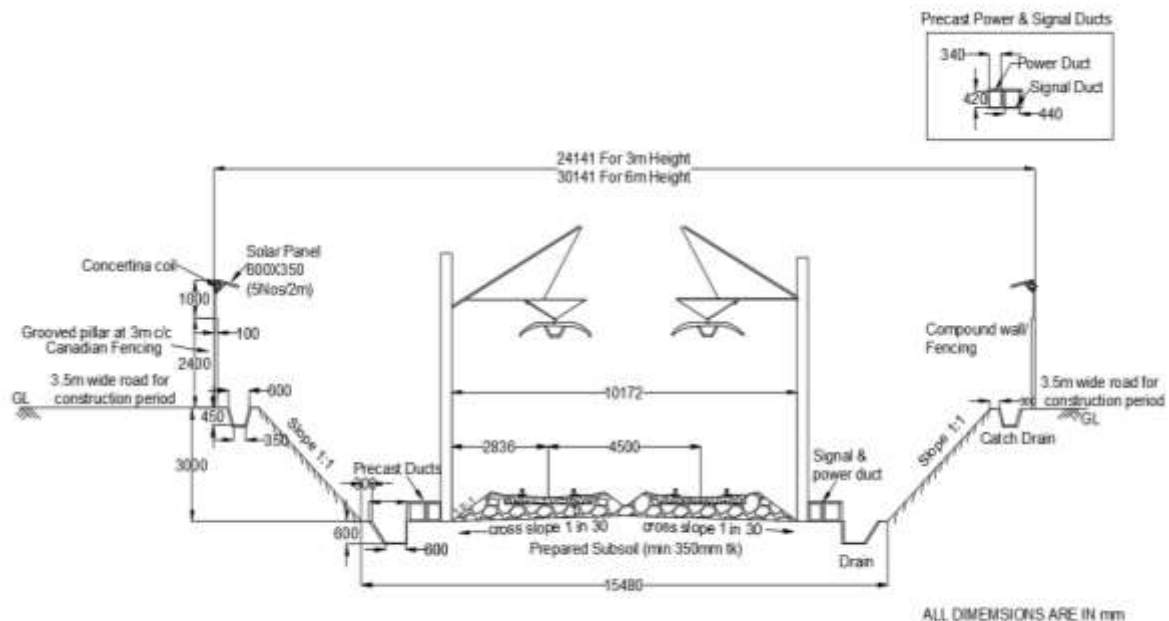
Typical arrangement without RCC retaining wall (0-6m)
